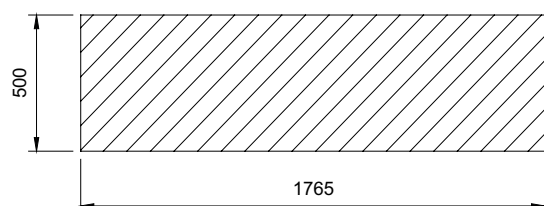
Schematic drawing of the solid blocks placed outside the Supercontainers (distance blocks).
